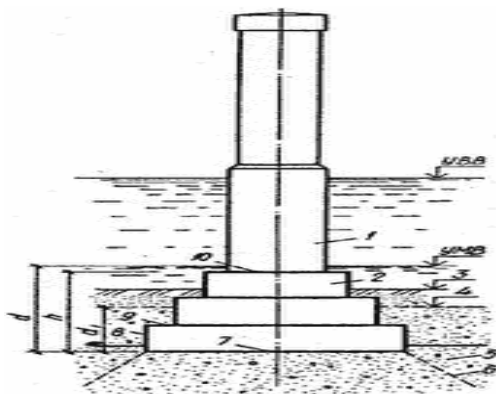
The foundation of the bridge support from one bearing element 1 is the above-foundation part of the support; 2 - foundation; 3 - soil surface (bottom of watercourse); 4 - level of erosion; 5 - bearing layer of soil; 6 - conditional base contour; 7 - foundation base; 8 - side face of foundation; 9 - ledge; 10 - foundation cut; d - foundation laying depth; A - foundation height; d1 - design burial of foundation into soil
